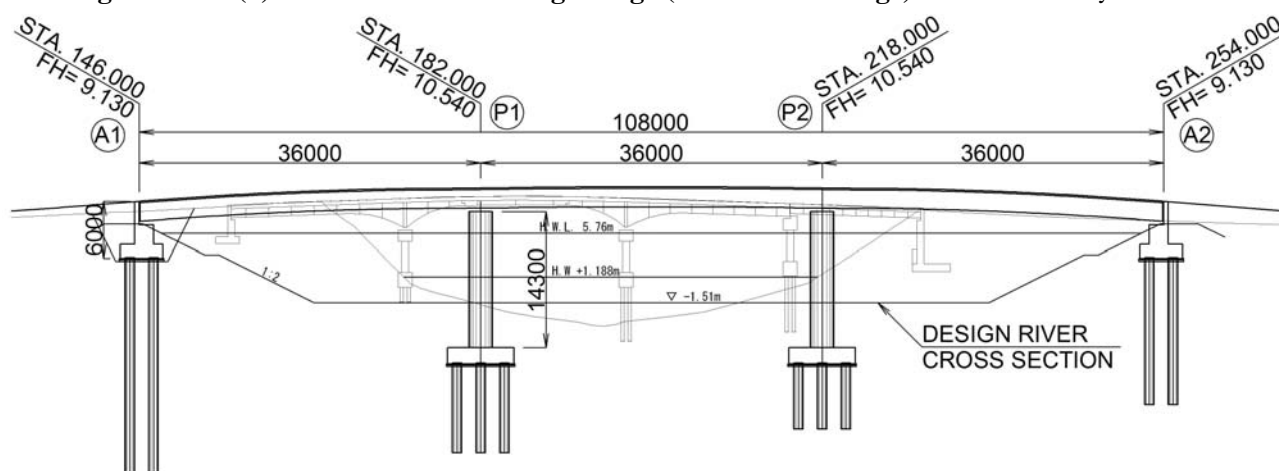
(2) Side view of new bridge (Nadi Town Bridge) Source: JICA Study Team
